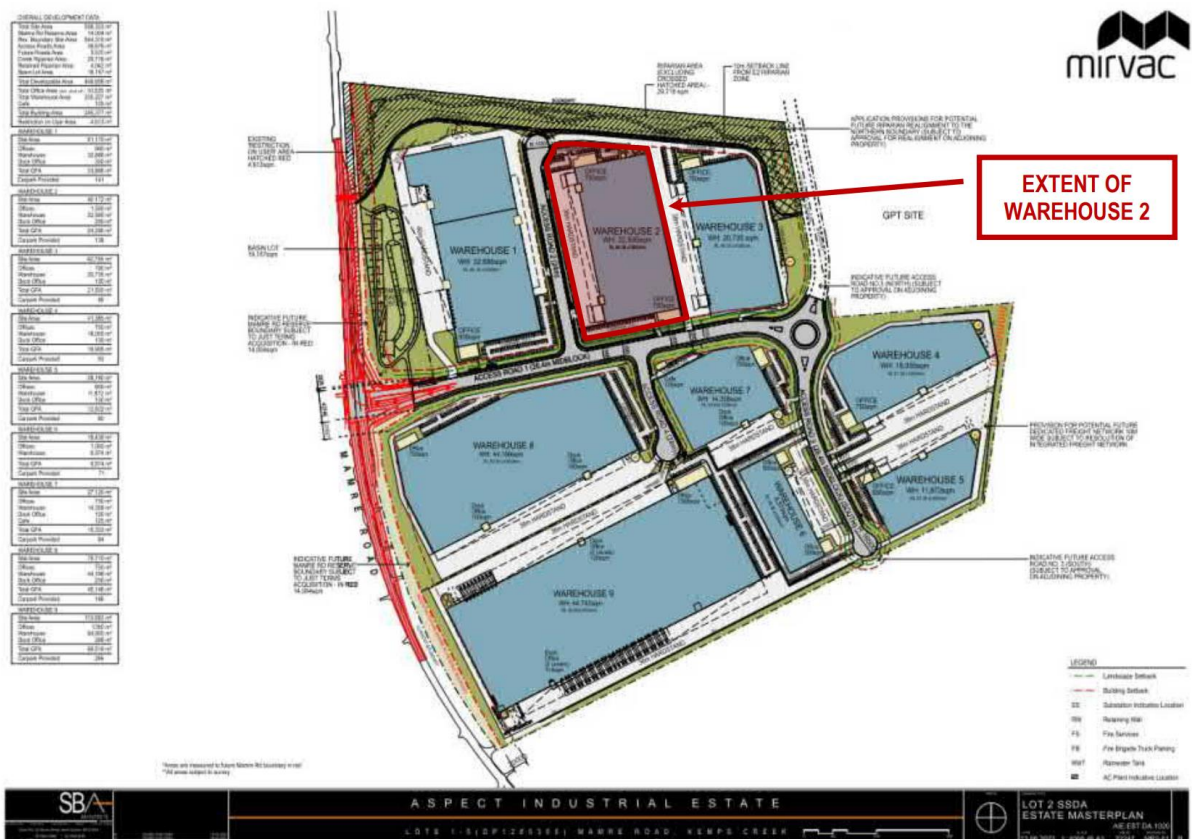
Site Plan – Lot 2 Warehouse as per SSD 58257960
